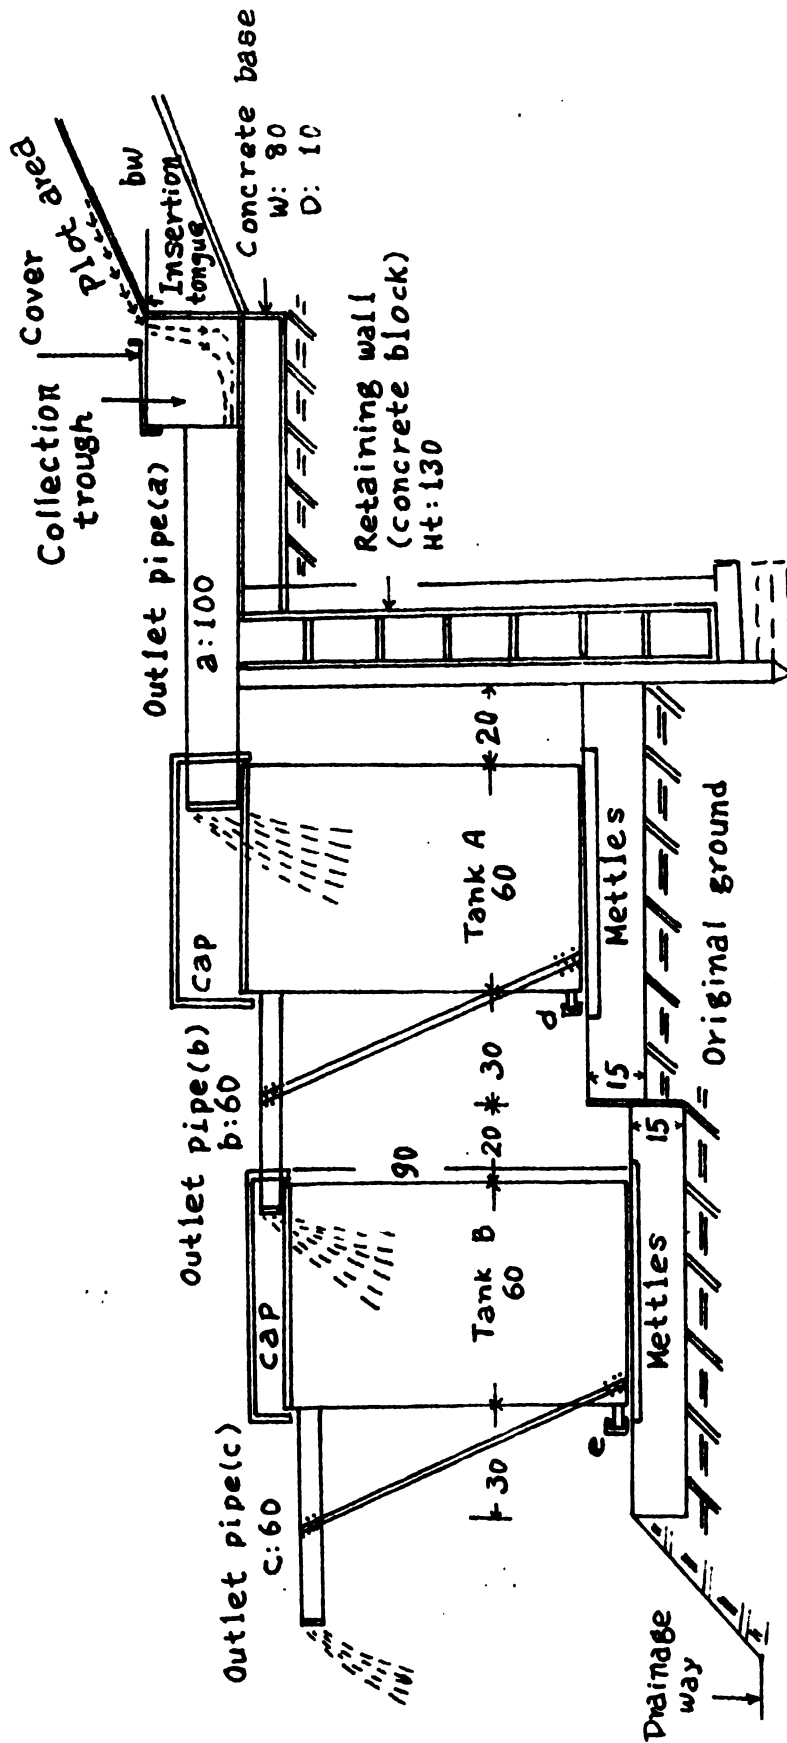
Side view of tank A & B, outlet pipe a, b, c, d, e, trough, retaining wall, and concrete base (Unit : cm)
